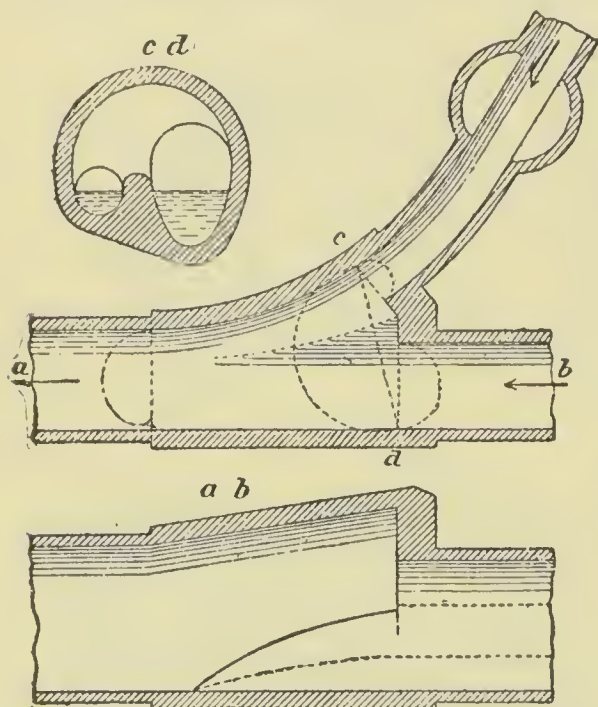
INTERSECTION OF CONCRETE SEWERS,
